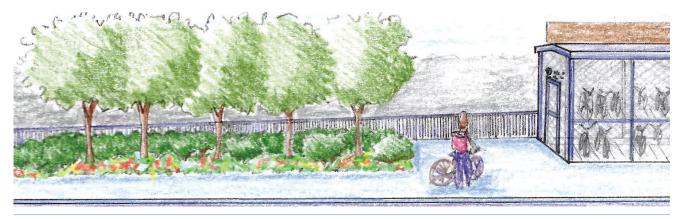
College Station Entrance Plaza and Bicycle Storage Facility.
